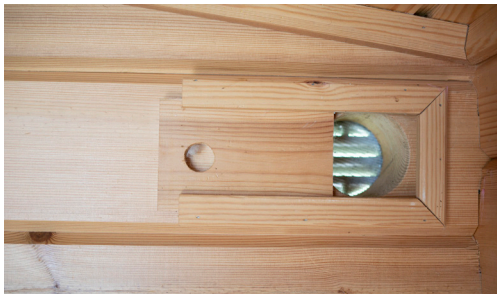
Traditional ventilation hatch in sauna cabins was made out of wood and open a channel straight through the wall into outside. The wood can be finished along with the rest of the interior.
